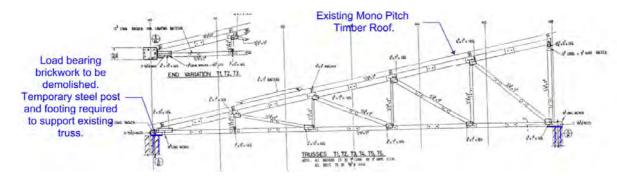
Typical section of existing structure, at the link between stage 1 and 2.
